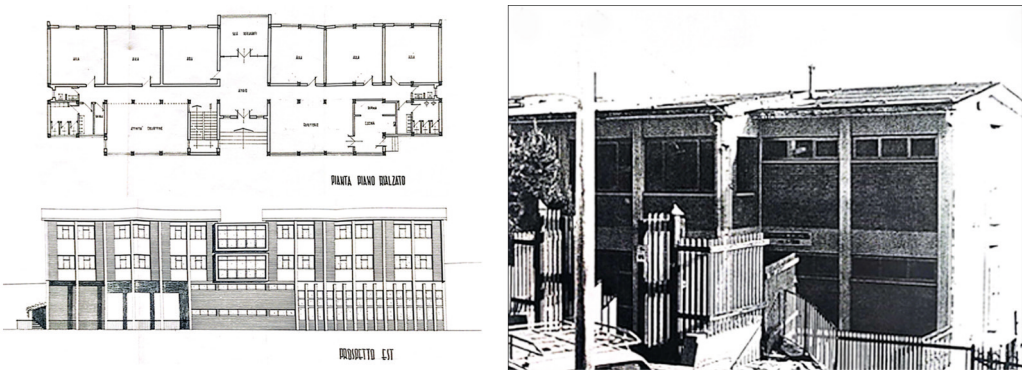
Image collage. On the left: graphic drawings, such as plans and elevations of the Aldo Moro school building executive project, 1971 (source: State Archives, Matera); on the right: historical photo of the school building (source: Municipal Archives of Accettura).
